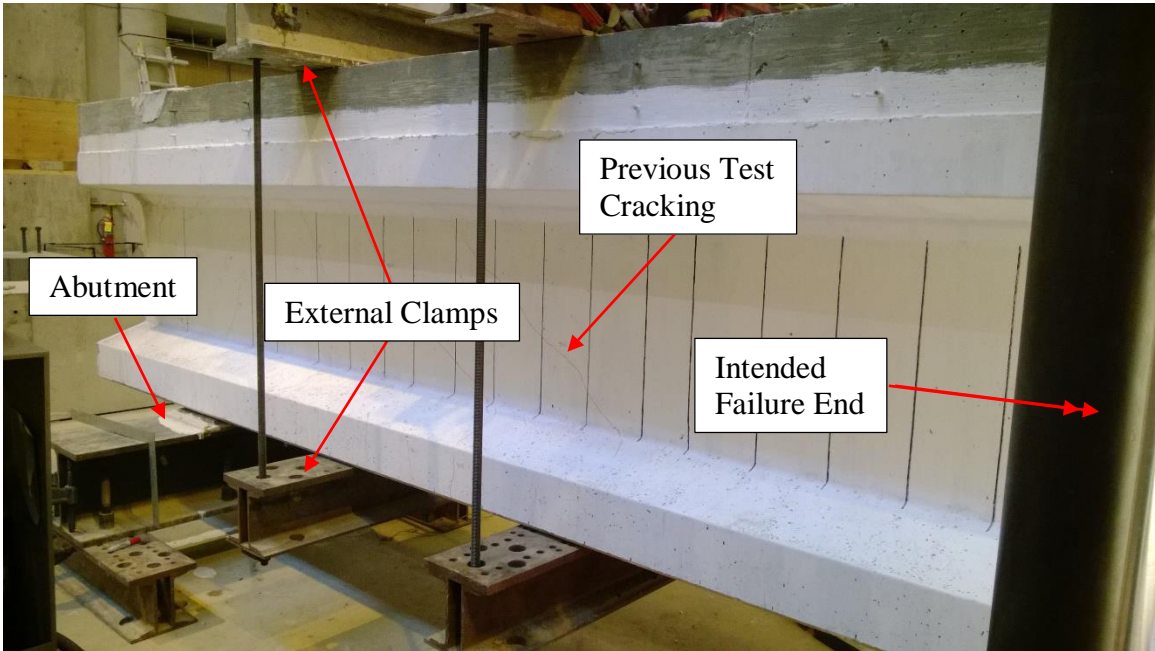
Steel clamps provided additional external shear reinforcement during the second end tests for the 36M and 45M (shown here) girders.
